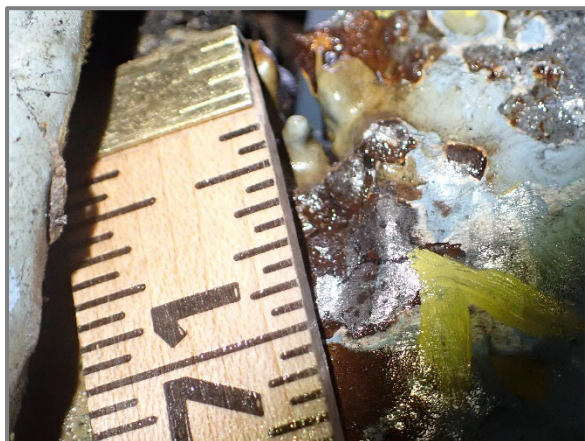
Floorbeam 9 in Span 2 bottom 5/8" long crack in the forward top web cope at the Right Truss after grinding and magnetic particle testing.
